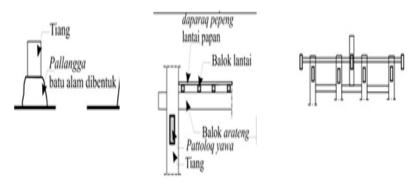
Construction of Umpak, Floor Beam and Upper Beam (Hartawan, 2017).
